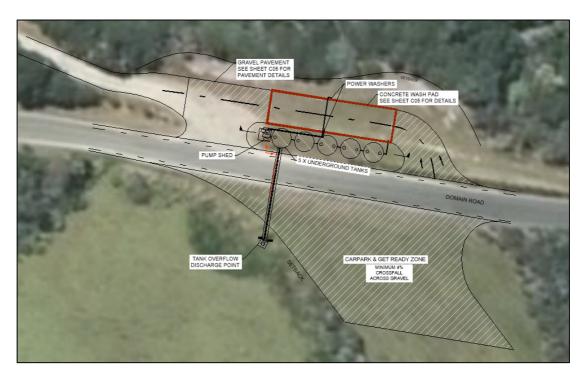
Proposed washdown facility - general arrangement. See sheet C02 of the drawing set in Appendix B.
